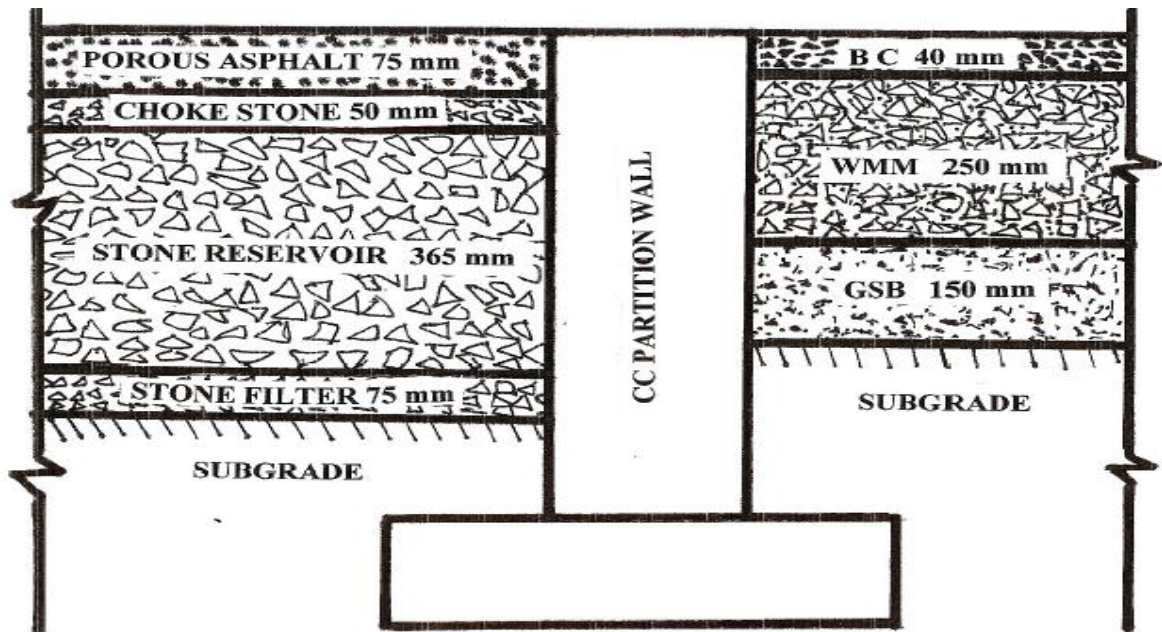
4 : Porous Asphalt Pavement on Left and Conventional Pavement on Right Separated by Cement Concrete Wall
